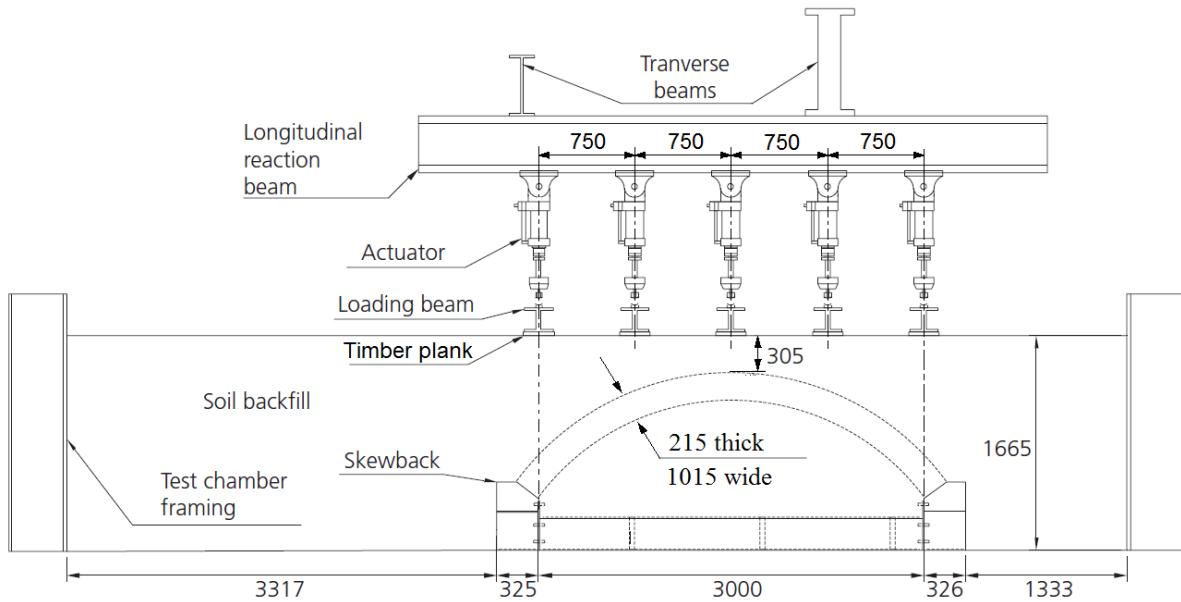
Longitudinal cross section of the arch fill system within the test chamber, showing loading actuator arrangement and supporting structural elements
